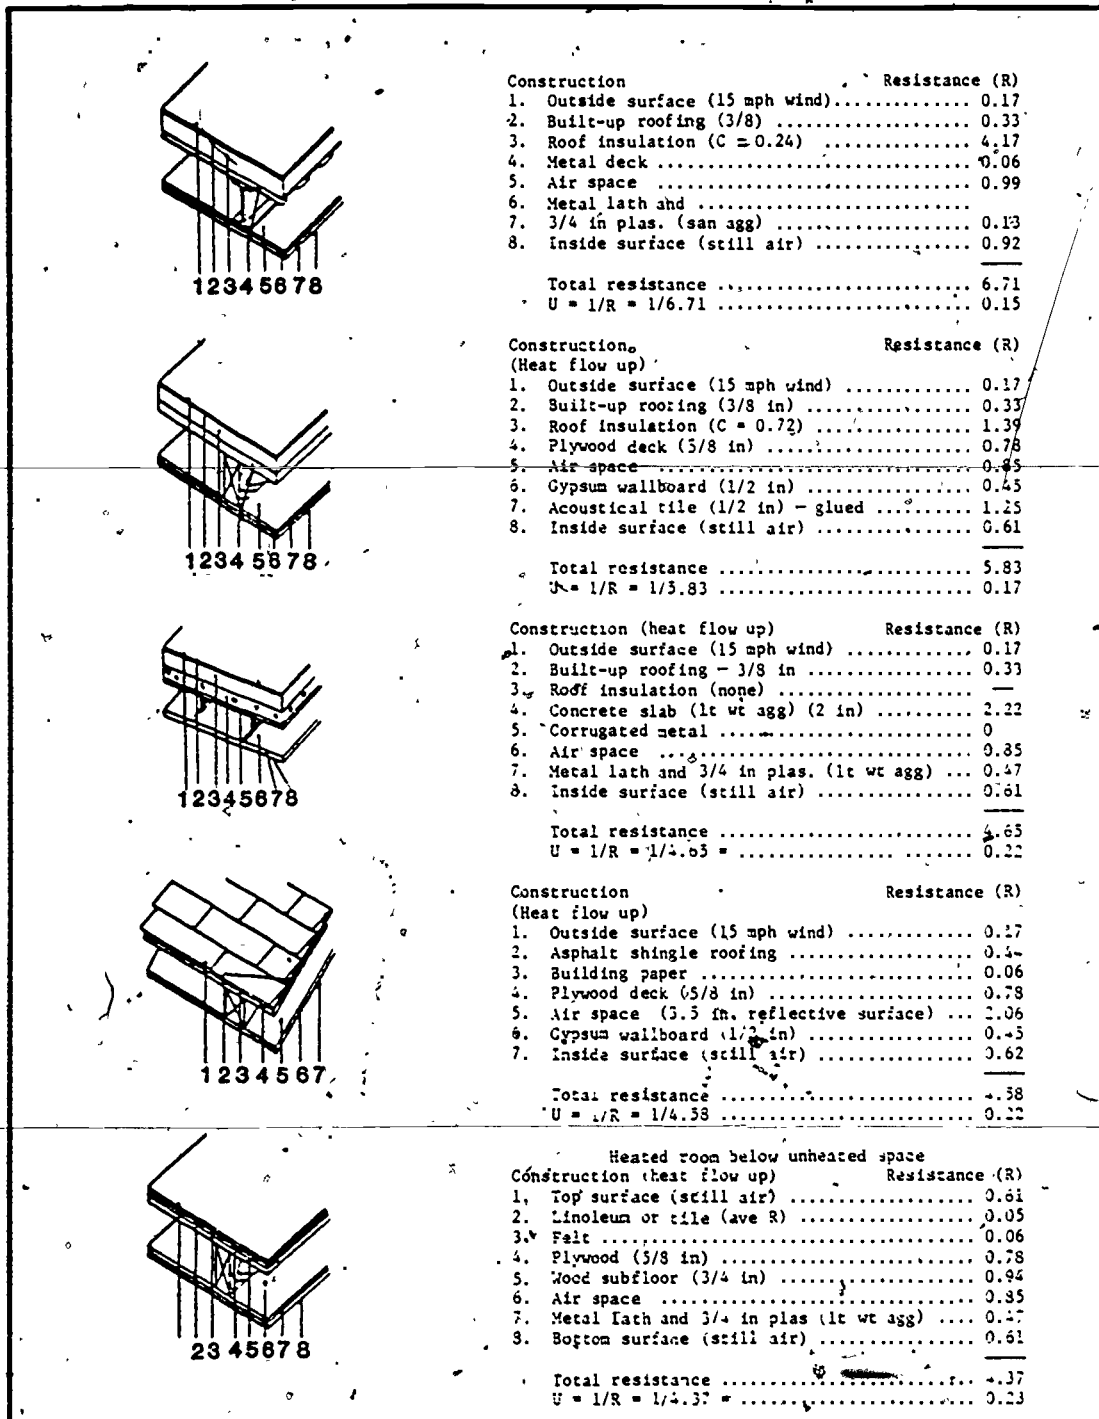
U Values for Typical Wall and Roof Construction (Roofs).
